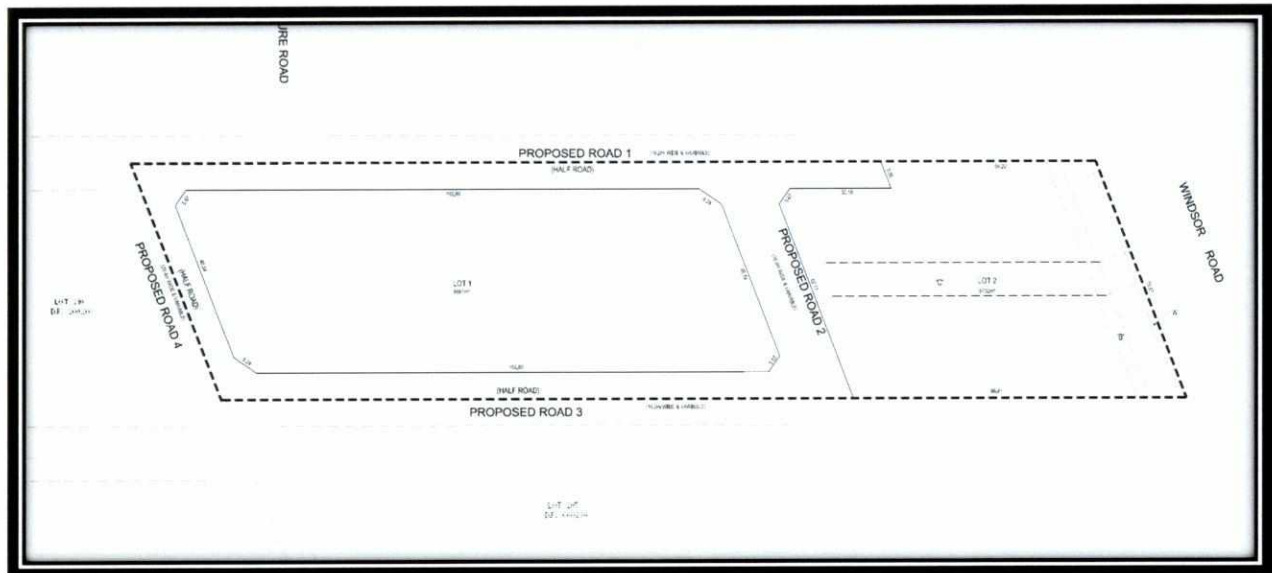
Copy of subdivision plan (Craig and Rhodes, 2014)
